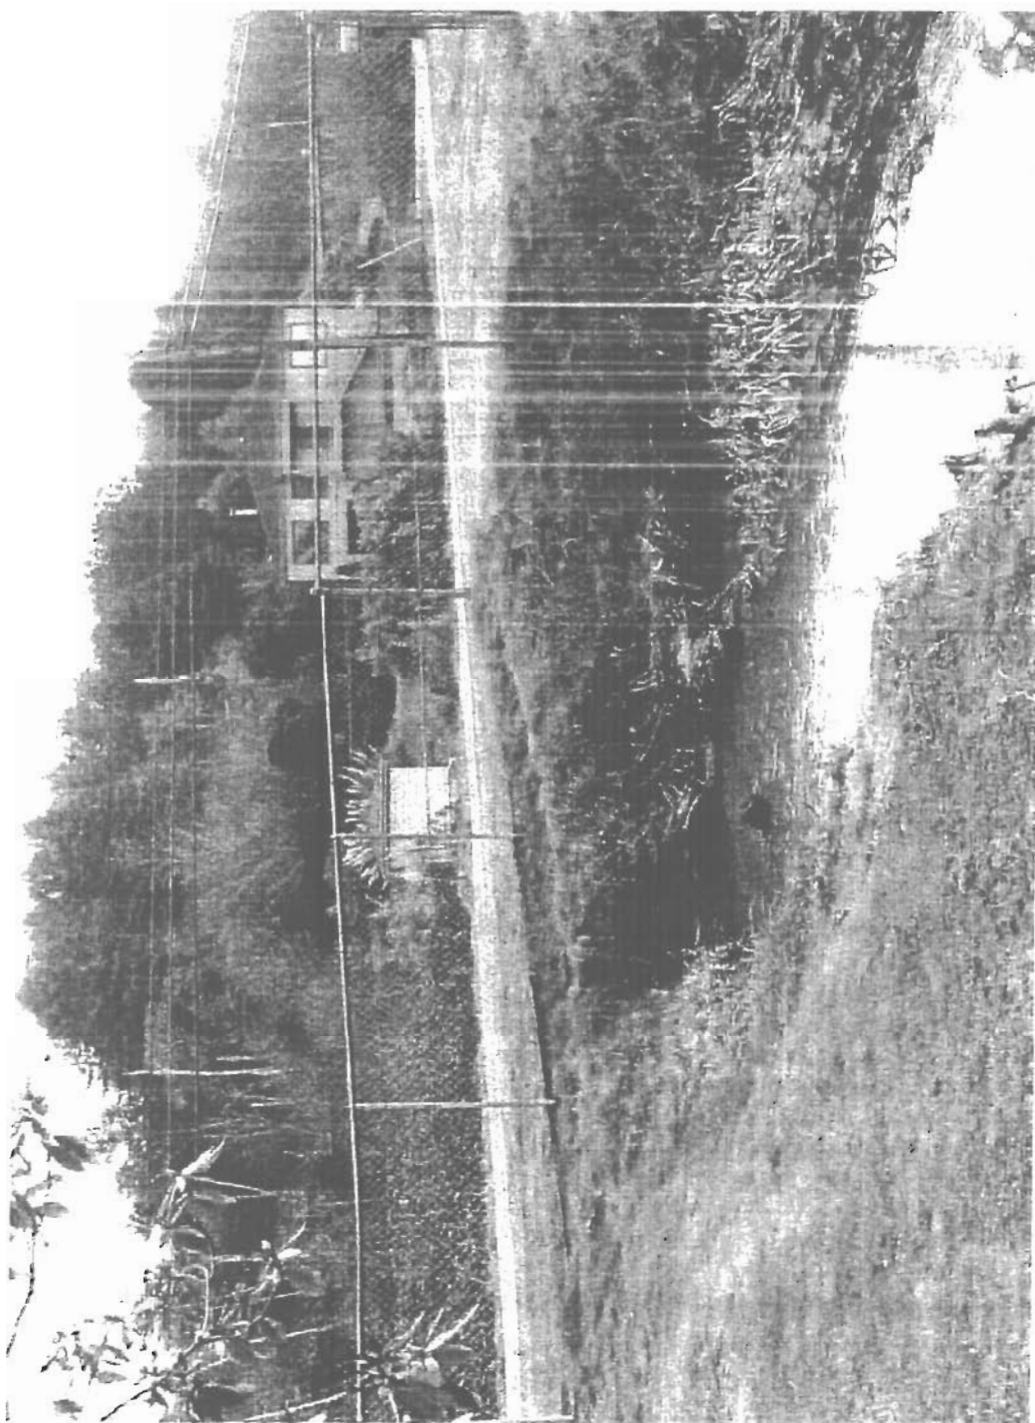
Downstream view of primary culverts and main channel culverts passing under Old Arcata Road. The second culvert is underwater in this photo.
